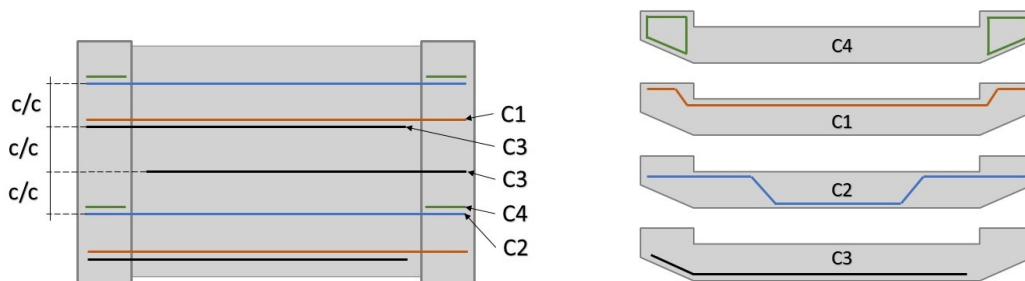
Layout of the bridge deck reinforcement in the transverse direction. c/c is either 100 or 120 mm, depending on the location in the bridge.
